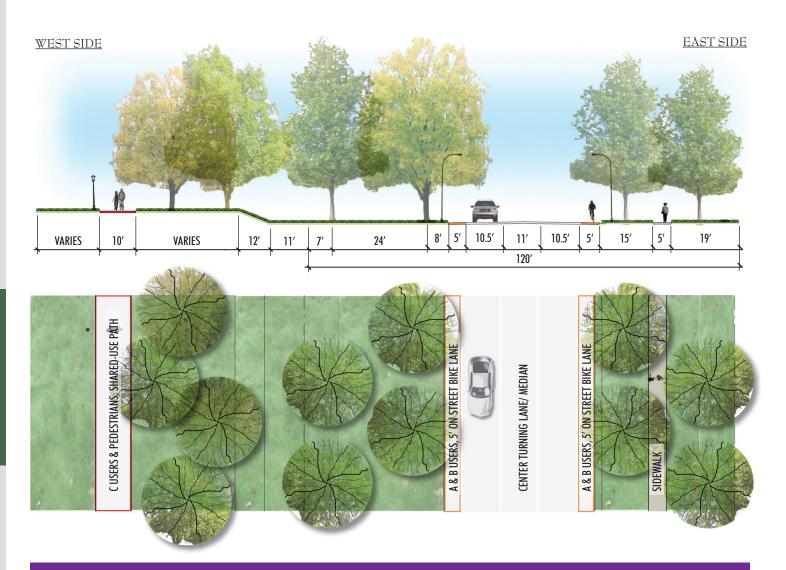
Southwestern Parkway: Zone 2 Prototypical Section & Plan - Chickasaw Park
